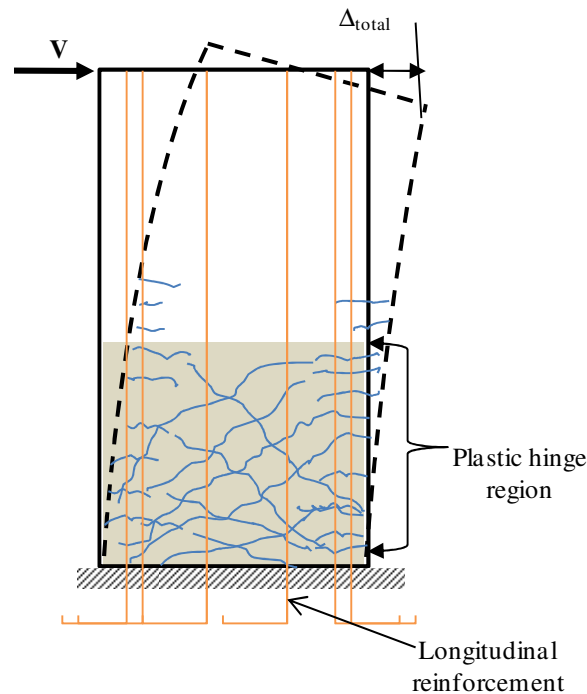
Plastic hinge region of a cast-in-place reinforced concrete wall
